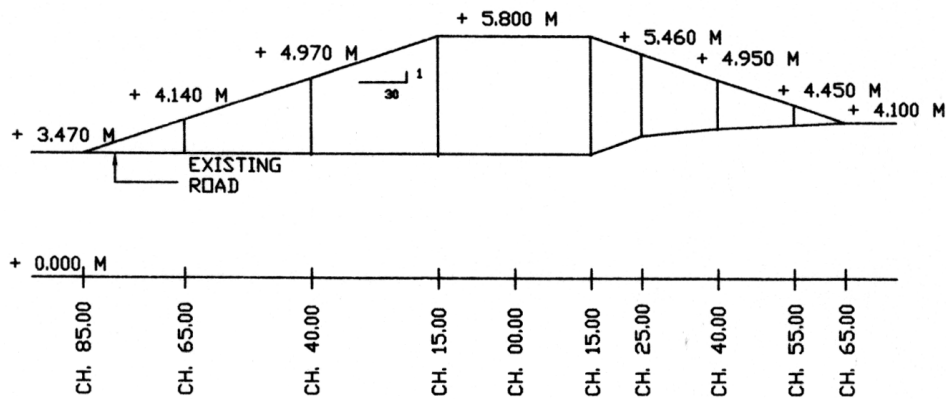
Longitudinal section of geosynthetic reinforced soil wall
